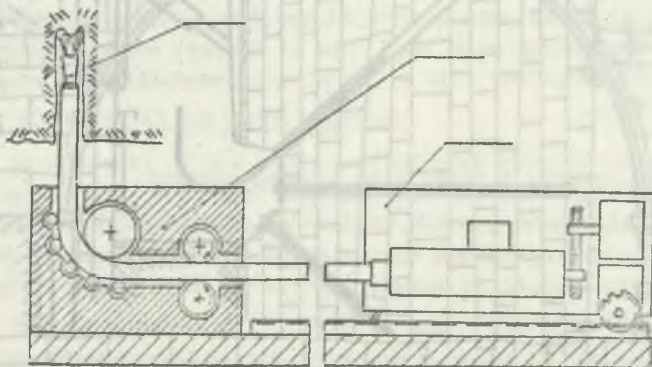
Machine for angular hole drilling with the help of water jet under high pressure
